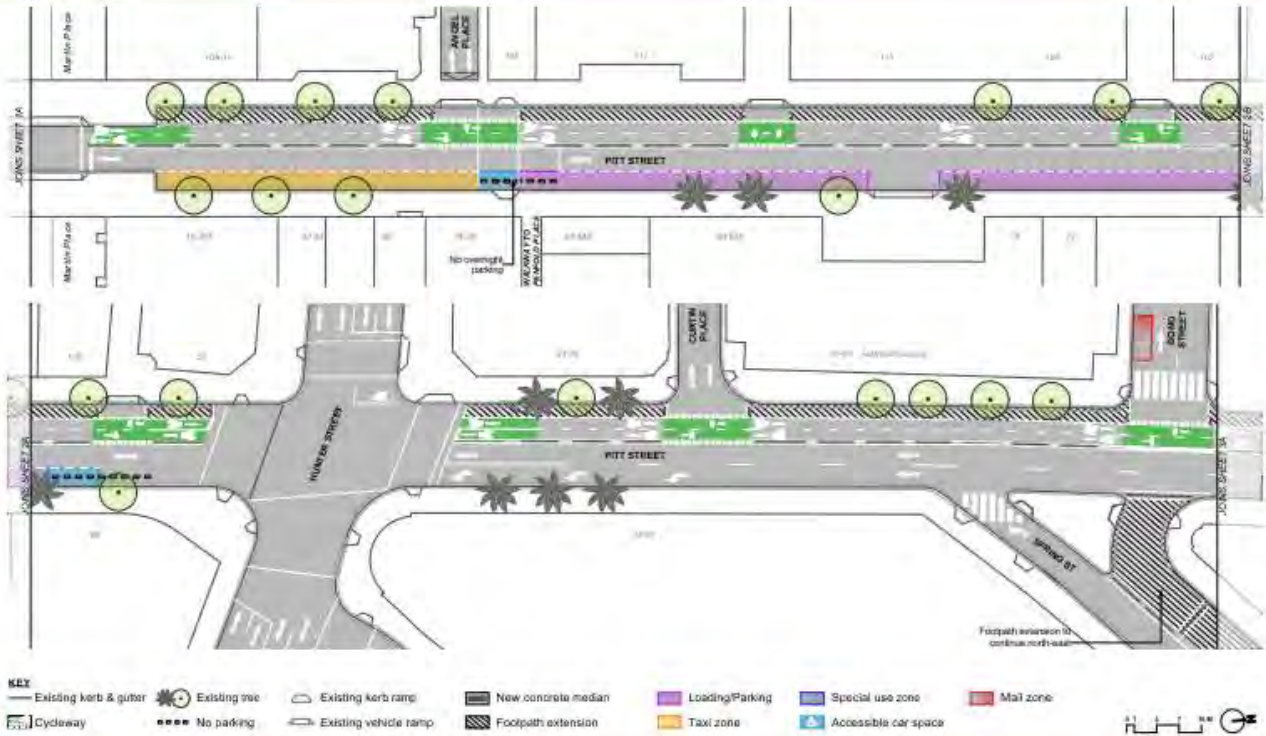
Draft Concept Design Plan – Sheet 1 of 4 (Source: City of Sydney, 2021)
